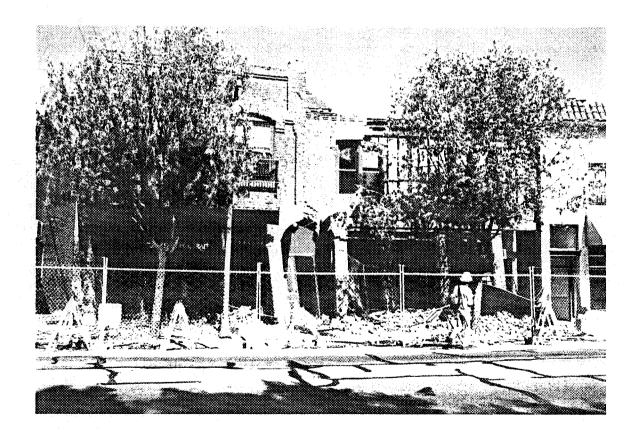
Heavily damaged unreinforced masonry wall building - 39 Main Street, Los Gatos
